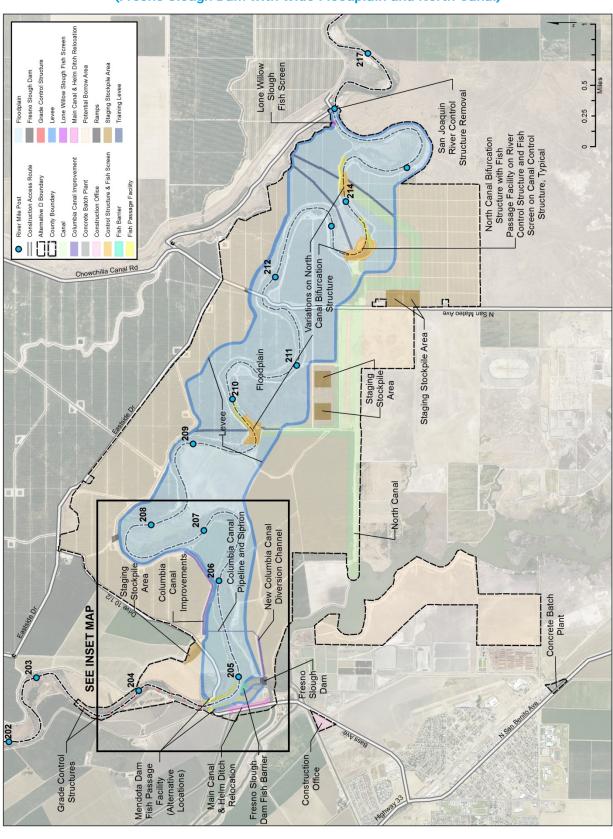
Plan View of Alternative D (Fresno Slough Dam with Wide Floodplain and North Canal)
